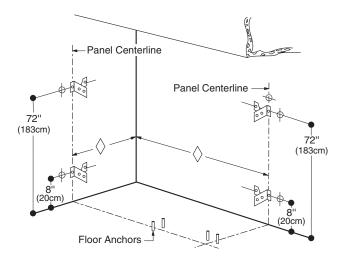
Floor-Anchored or Ceiling-Hung Alcove Open Layout.
